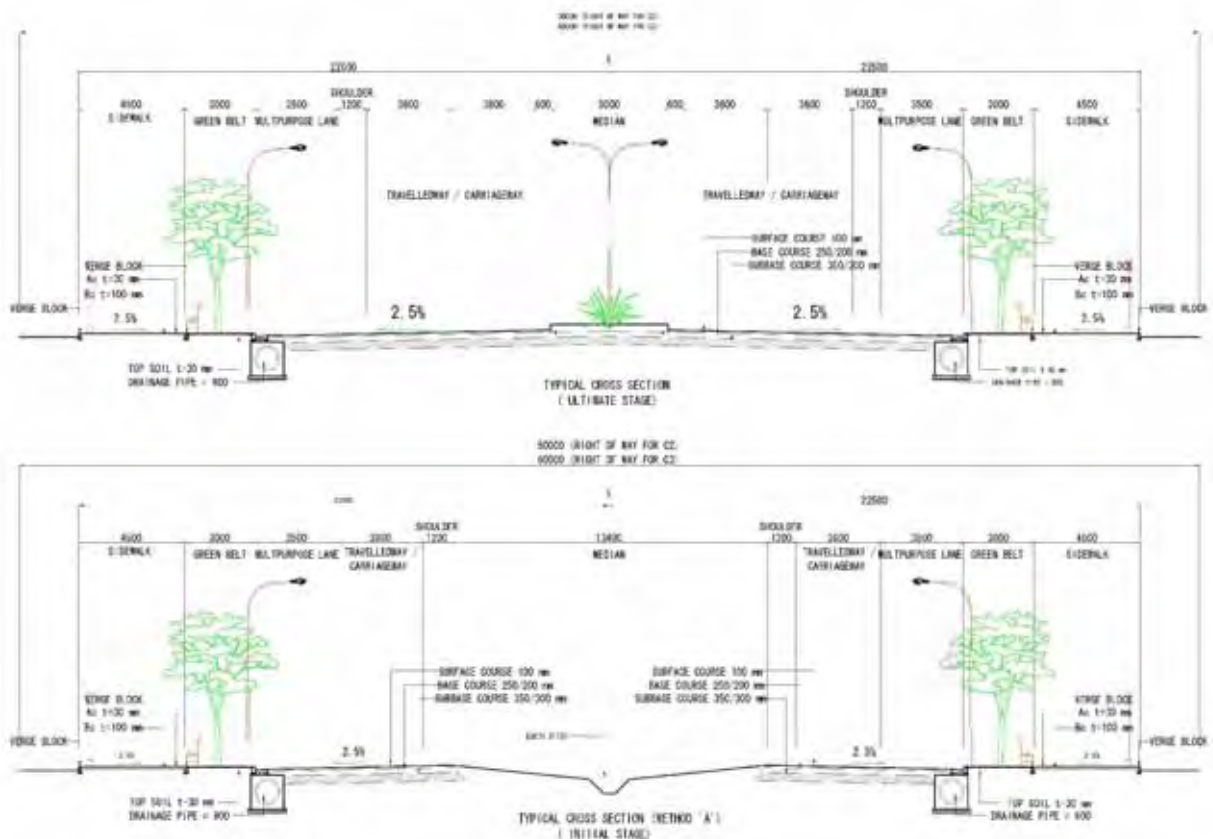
(a) Typical Cross Section of Circumferential Streets (C2 outside CCD and C3)
